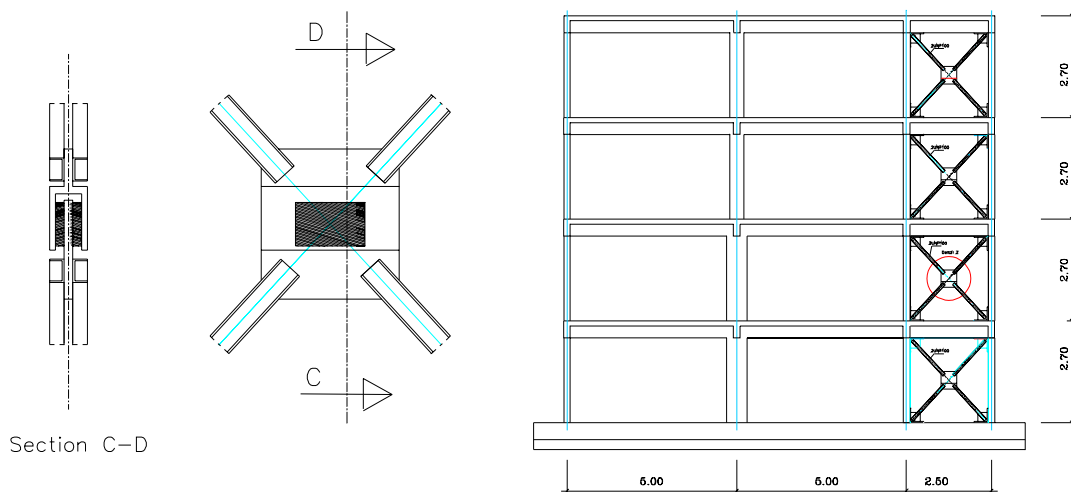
Bracing system in the shorter-external bay: device details and general layout
